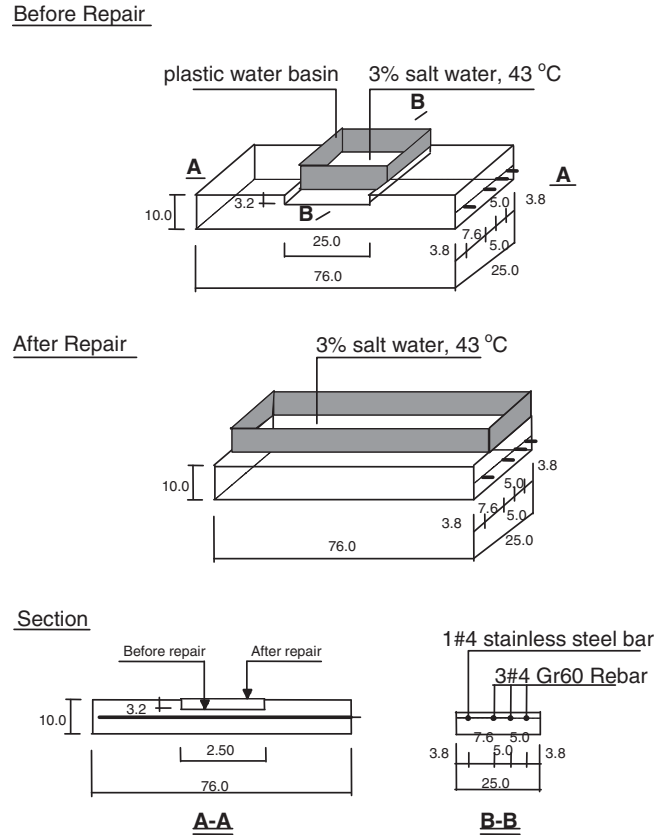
Configuration of concrete specimens (CS groups, unit: cm).
